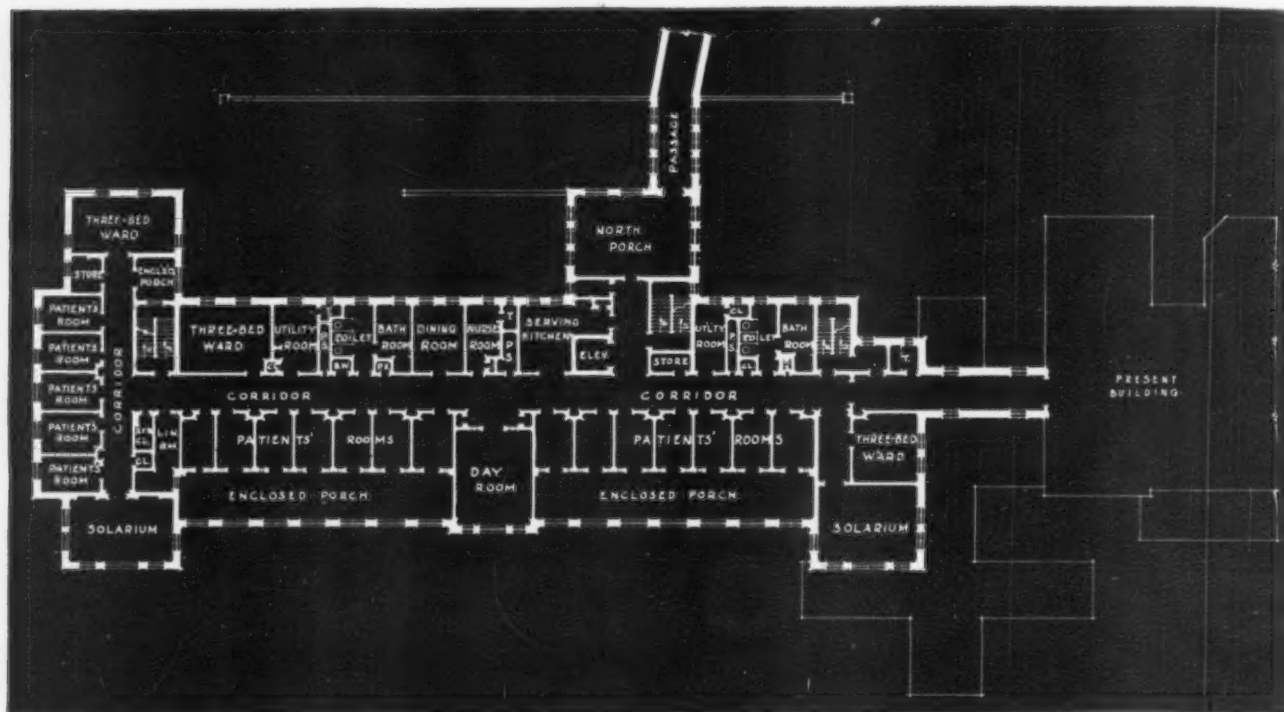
This typical floor plan of the Infirmary Building shows the porch or solarium adjoining each room or ward.
